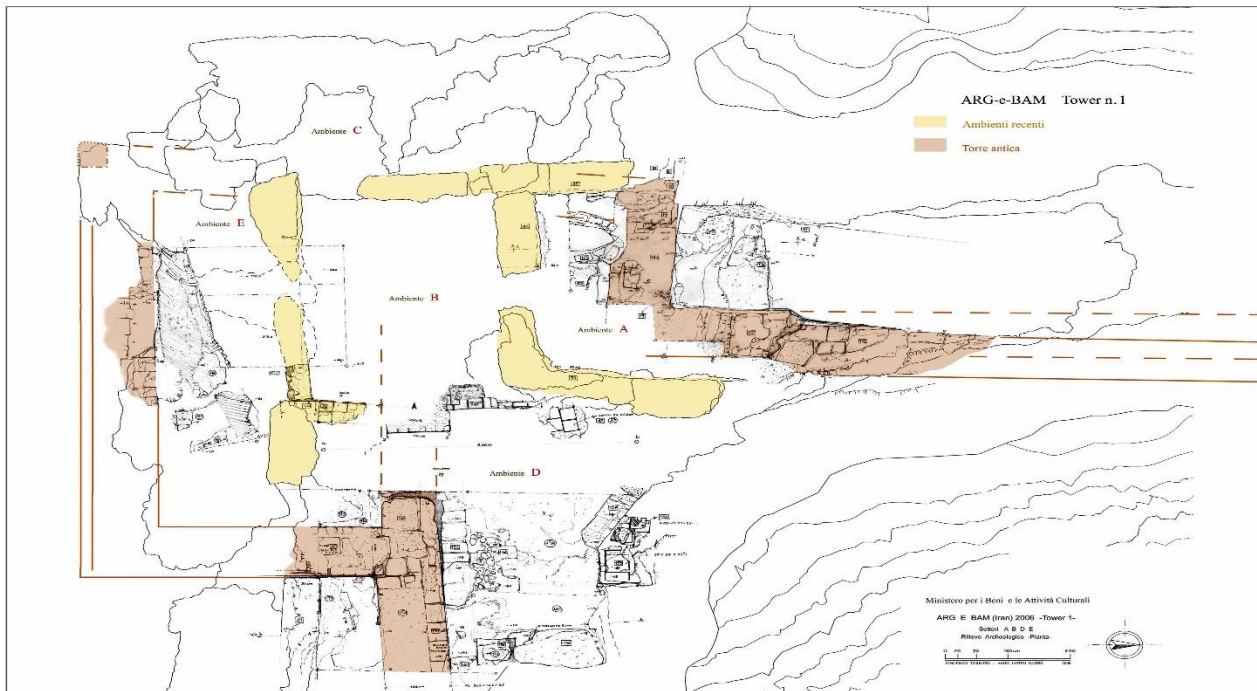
Plan of tower n° 1. In brown, tracing of the ancient tower and adjoining city walls (plan Vincenzo Torrieri).
